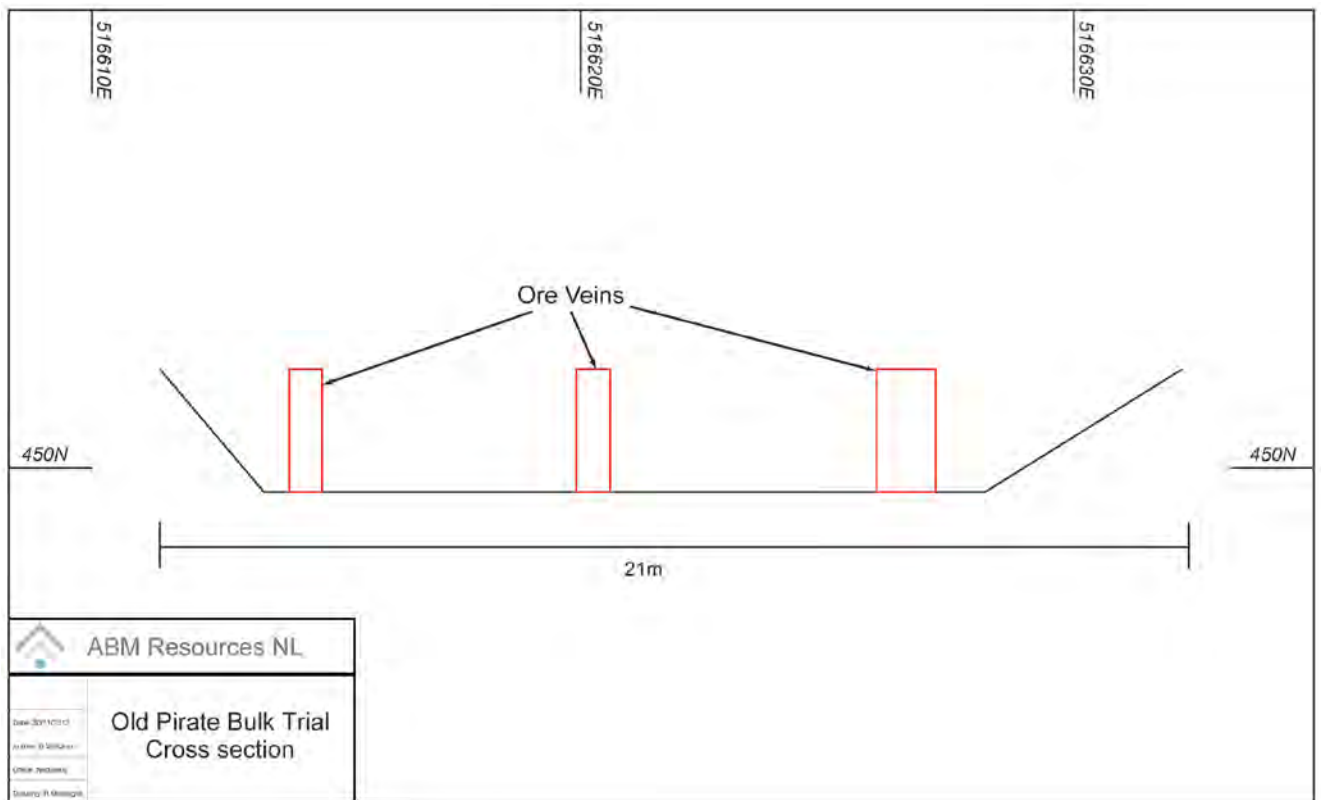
Bulk Sample Trench Cross Section Multiple Veins
